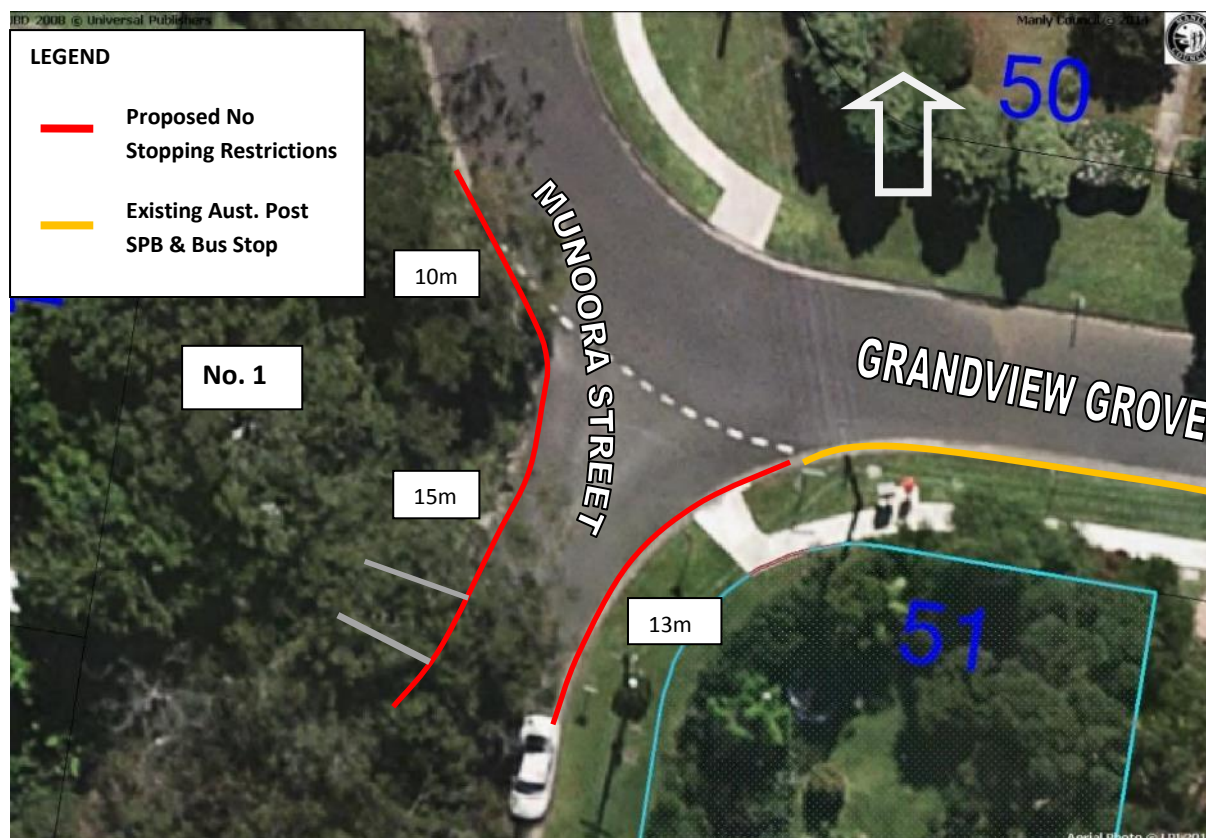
Proposed No Stopping Restrictions at The Intersection of Munoora Street and Grandview Grove
